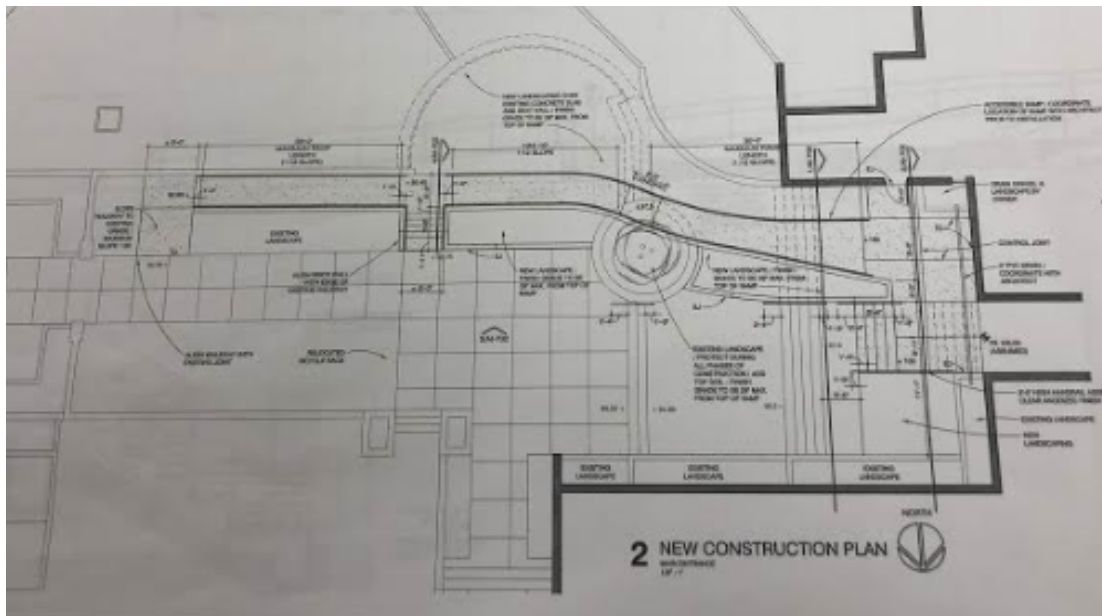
The 2009 design for the Storch basement ramp (Office of University Architect 2009).
